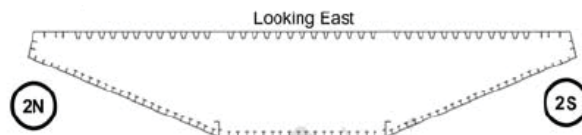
Typical OBG Cross Section Showing Longitudinal Weld Locations on the External Skin Plate
